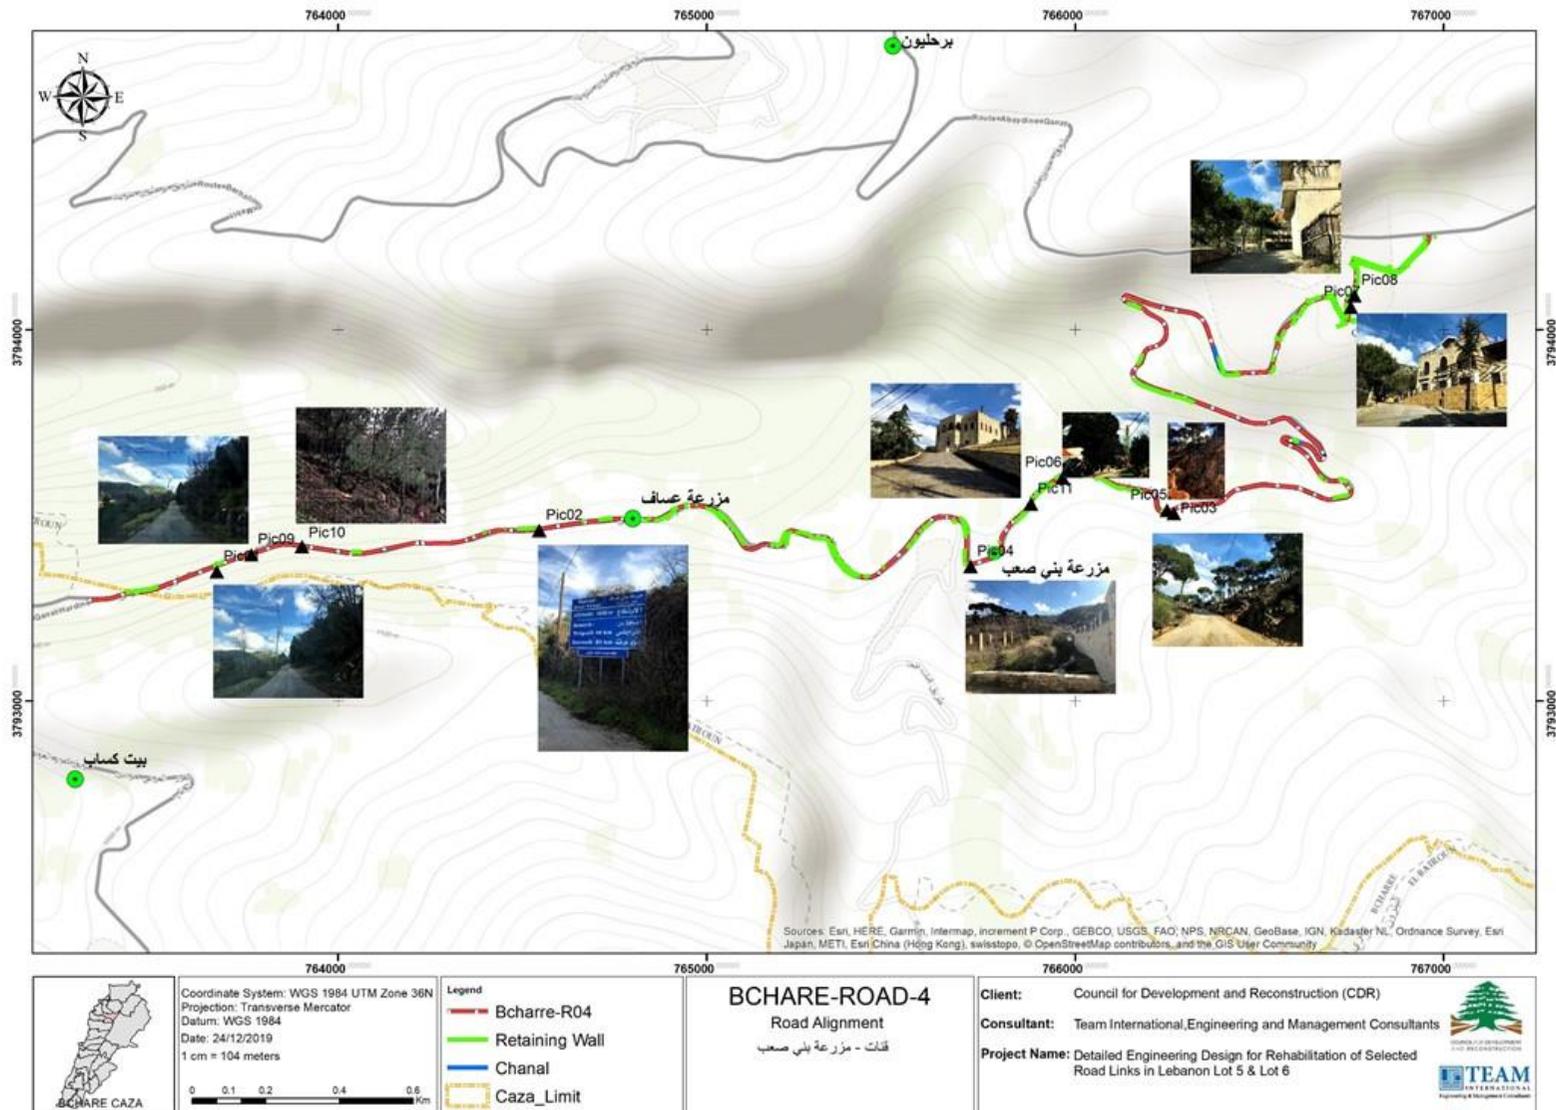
Road alignment of Bcharre Road 4 (Qnat - Mazraat Aassaf) with contour elevations
